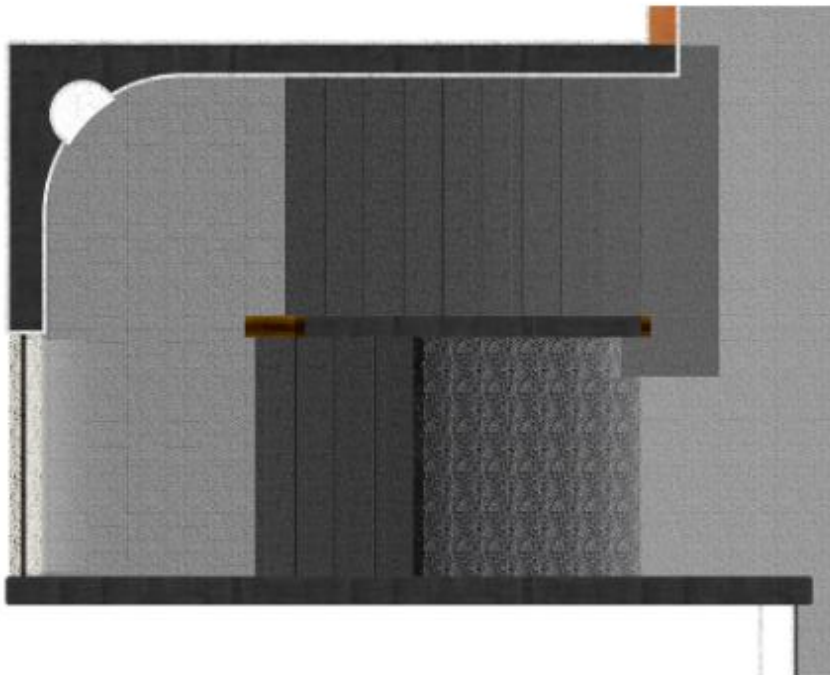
Plan drawing of the stair shaft attached to the classroom block at School of Mathematics building. (Produced by the Author)
